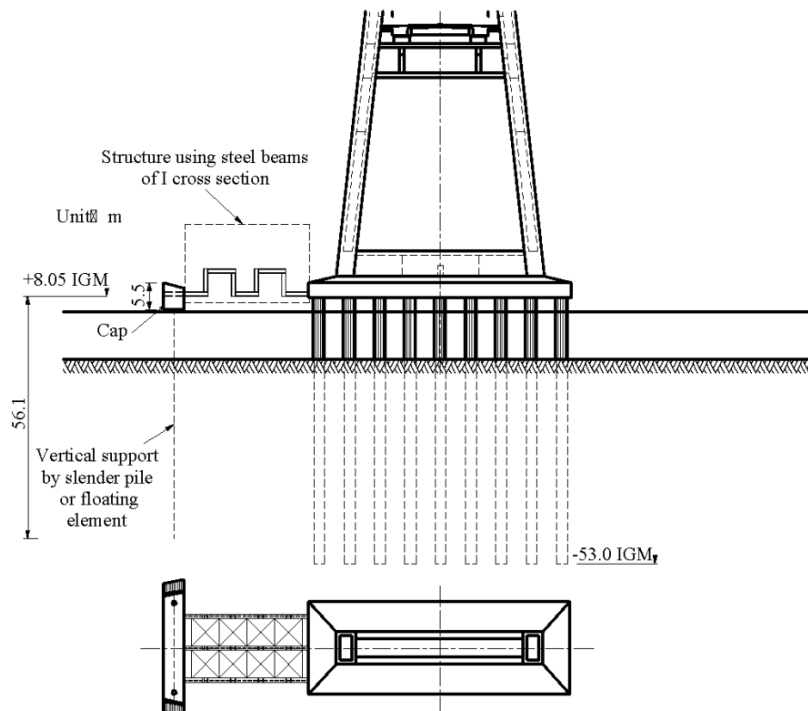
The structure connecting the cap and the bridge pier using steel beams of I-cross-section [7].
